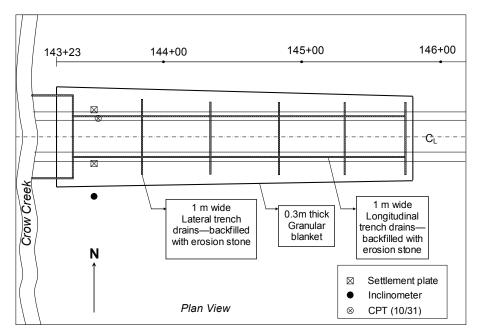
Plan view of Crow Creek embankment showing approximate locations of key design features and performance testing
